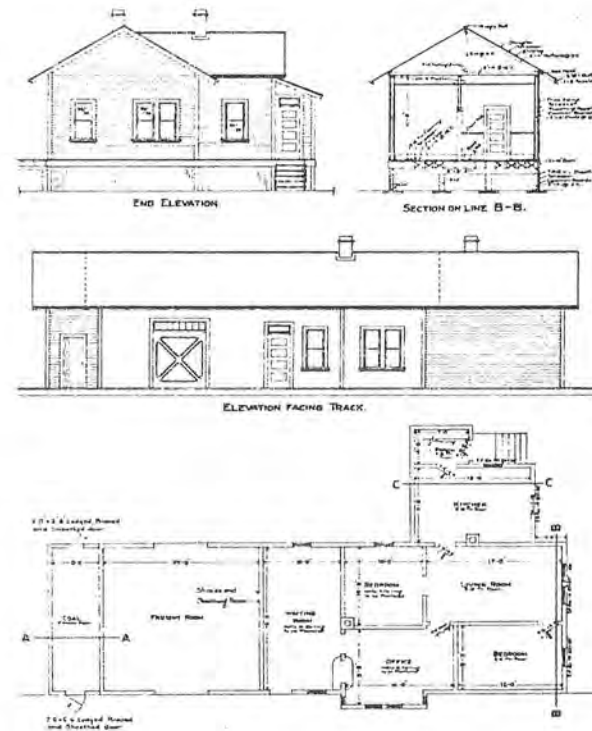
Canadian Northern's 4th class station plan 100-115.<sup>18</sup>
